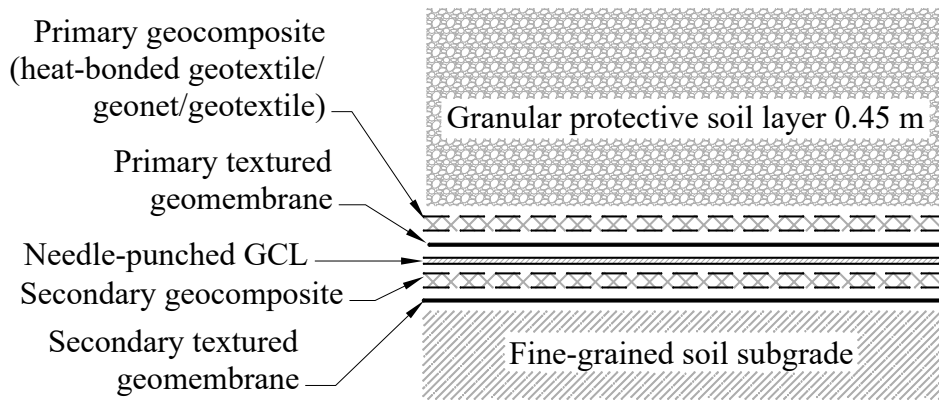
Detail of liner system that was used in a design example presented by Qian and Koerner (2010).
